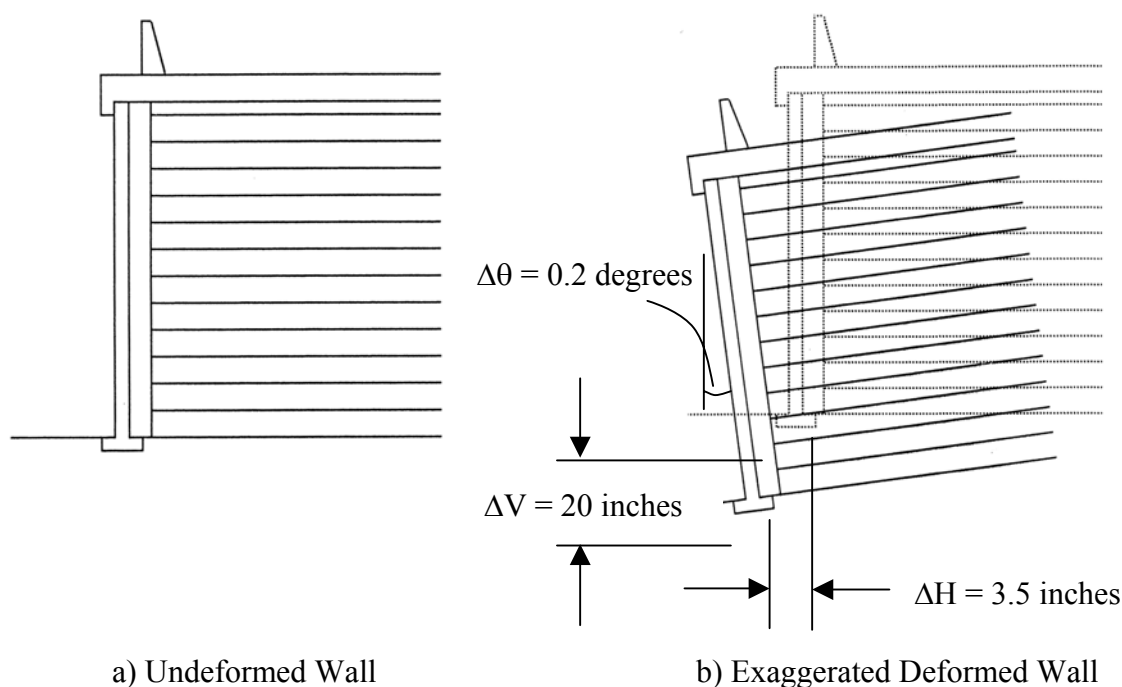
Comparison of the undeformed wall to an exaggeration of the deformed wall.
